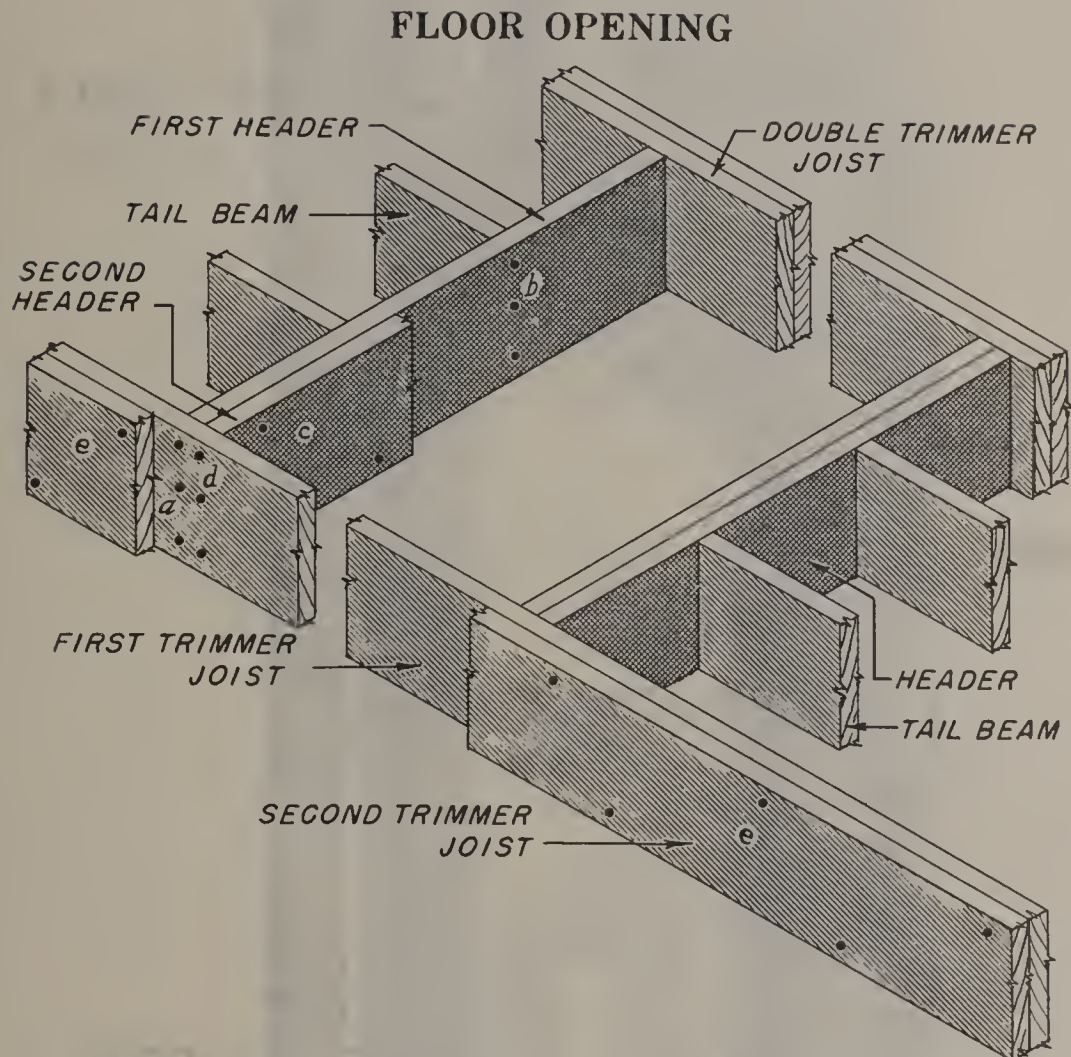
Floor opening. *a.* Nail through first trimmer joists into ends of first headers with three twenty-penny nails. *b.* Nail through first headers into ends of tail beams with three twenty-penny nails. *c.* Nail second headers to first with sixteenpenny nails spaced 6 inches longitudinally and placed near top and near bottom alternately. *d.* Nail through first trimmer into ends of second header with three twenty-penny nails. *e.* Nail second trimmer joist to first with sixteenpenny nails spaced 6 inches longitudinally and placed near top and near bottom alternately. Note: This nailing will support a concentrated load of 300 pounds at any point on the floor, or uniformly distributed load of 50 pounds per square foot with any spacing and span of tail beams ordinarily used in small house construction, provided the length of floor opening is parallel to the length of the joist. If the length of opening is at right angles to the joists, excessive loading may be brought to the junction of headers with trimmers. Anticipated loads should be checked and increased nailing or additional supports provided at these junctions if needed for the expected loads.
